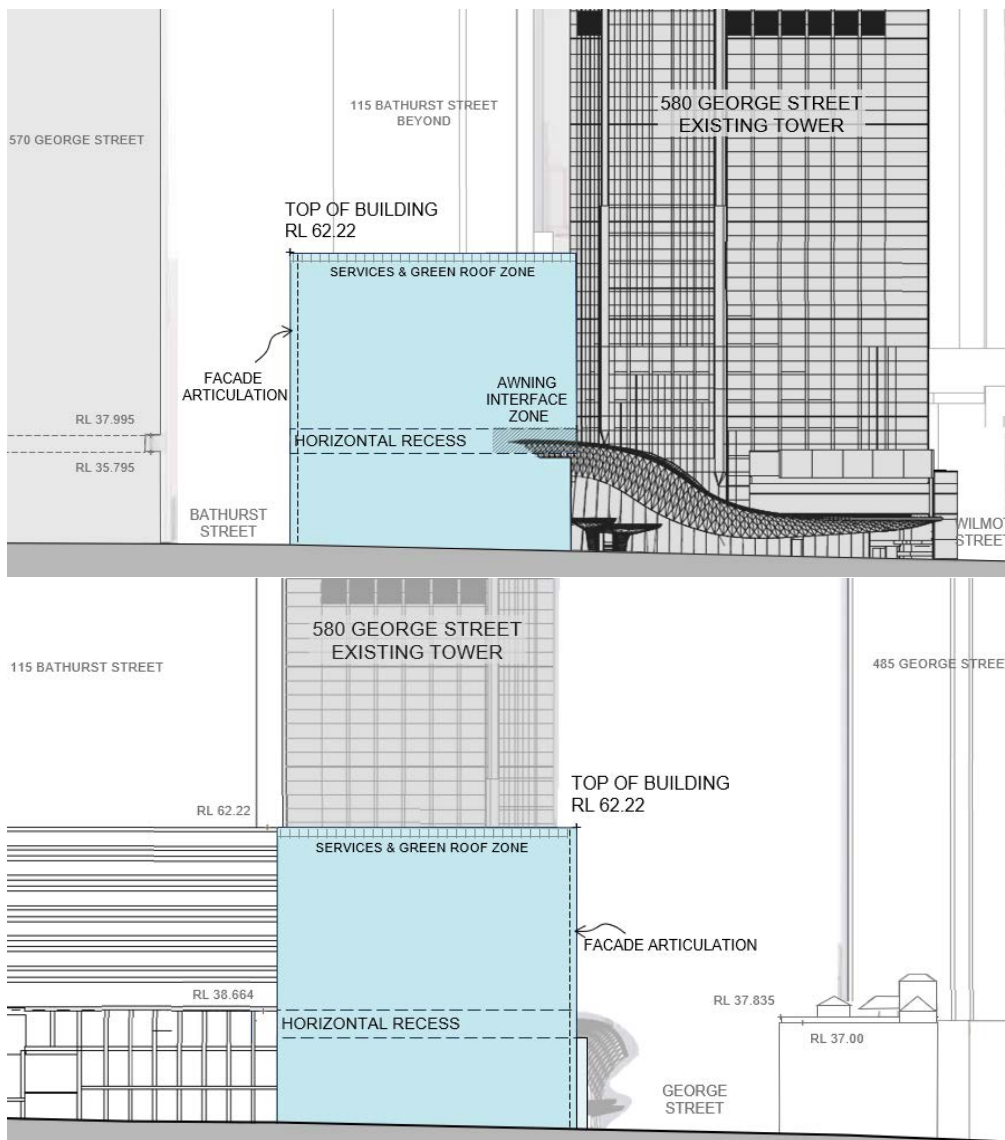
xx 580 George Street, Sydney – Planning envelope elevations
